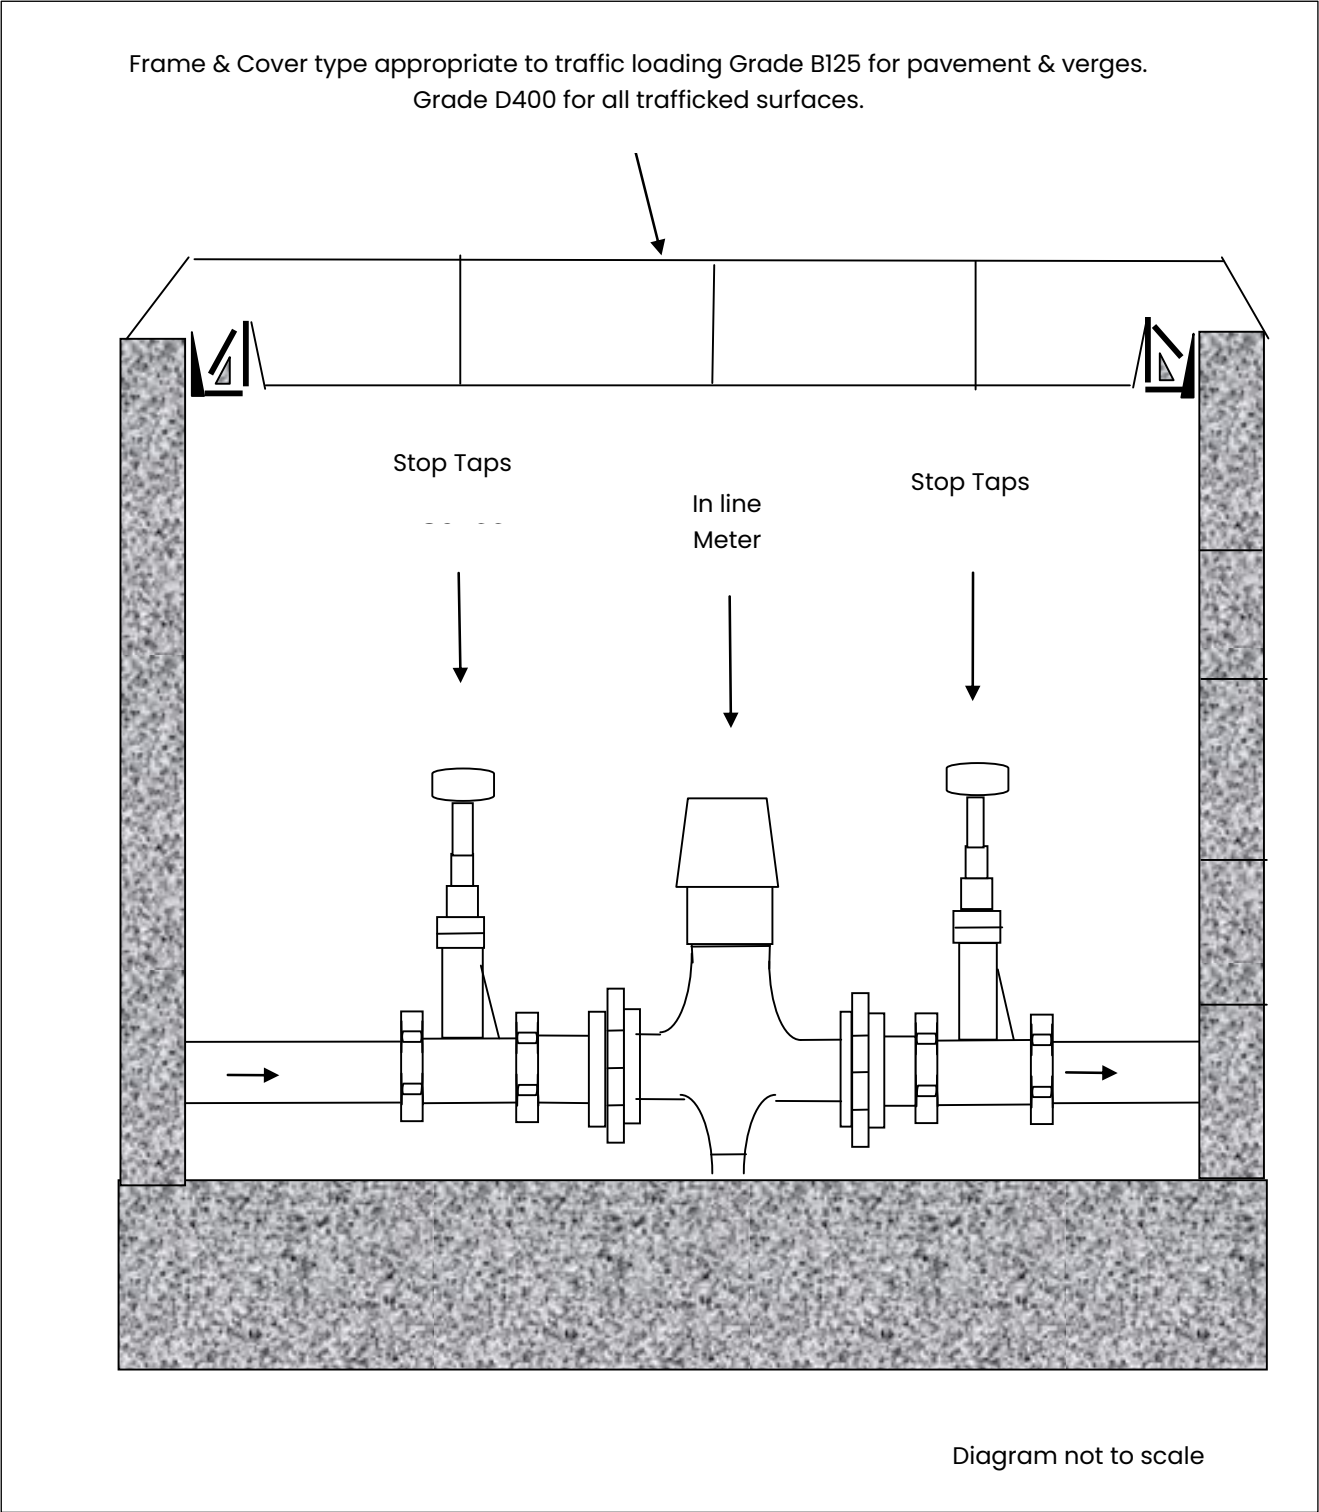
Standard Drawing for an External In-Line 20 – 39 mm Meter Installation in a Precast Concrete Chamber
